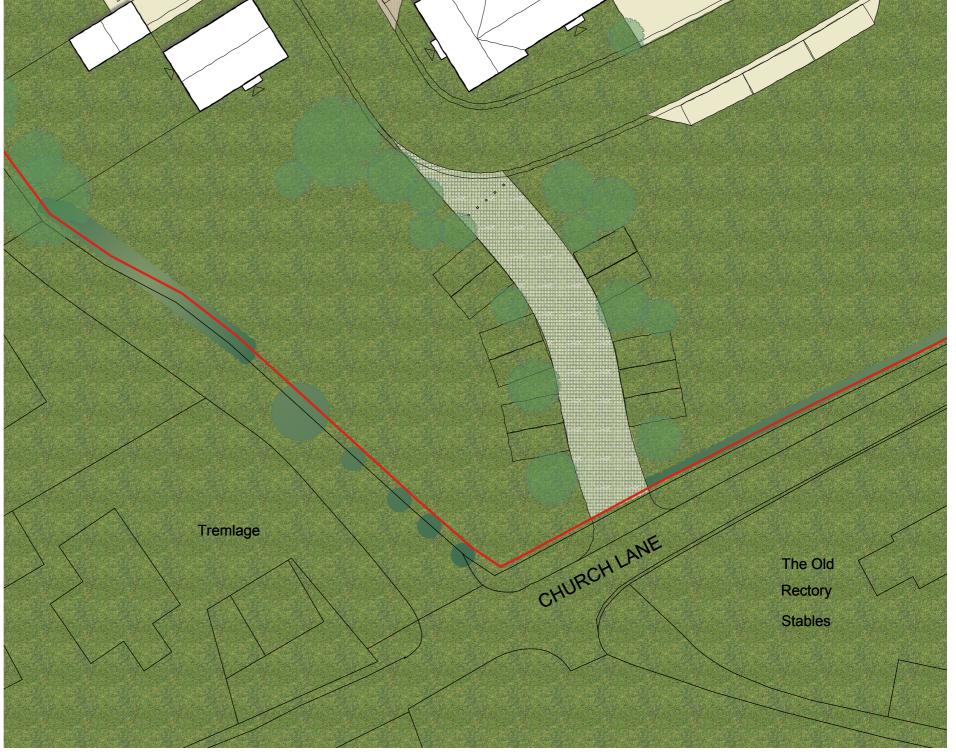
PROPOSED CHURCH LANE CAR PARK
